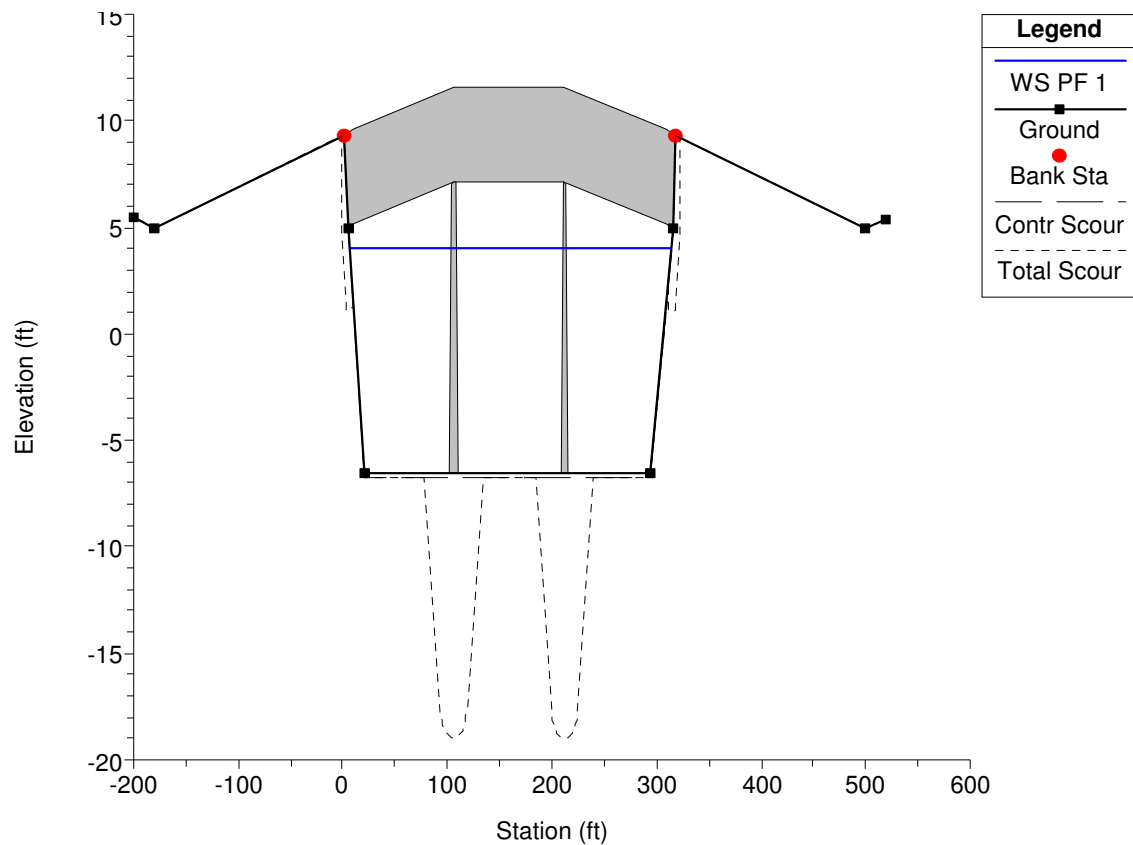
Cross-section of Kahaluu Bridge during 100-year flood
